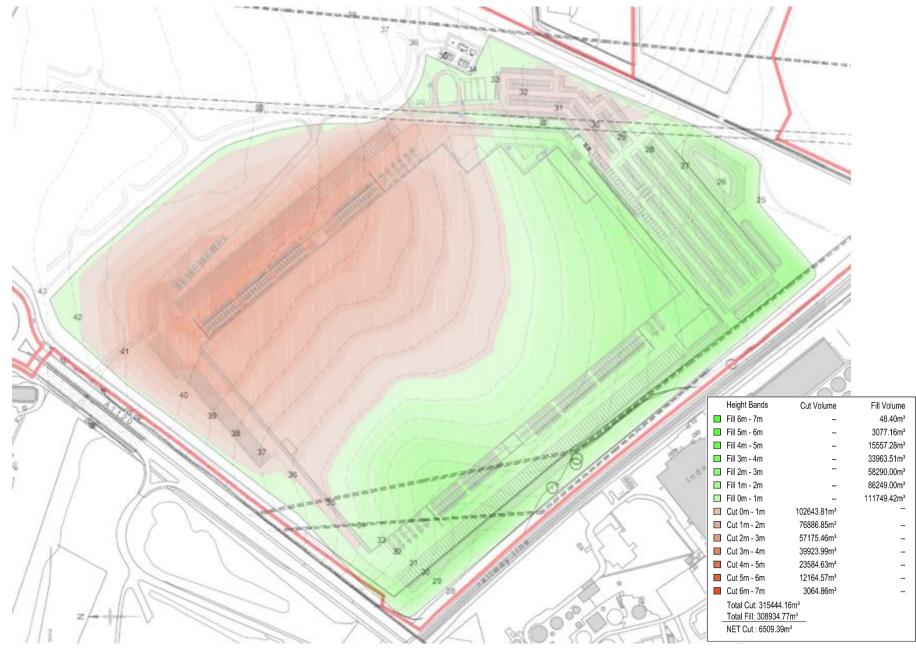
Existing site plan with levels submitted at outline overlayed on proposed cut and fill plan accompanying reserved matters
